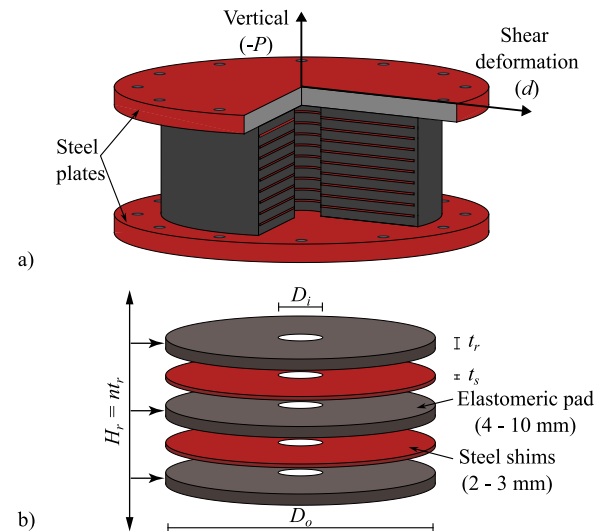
Sketch of the geometry and internal structure of an annular HDRB: (a) device; (b) isolator assemblage and dimensions.
